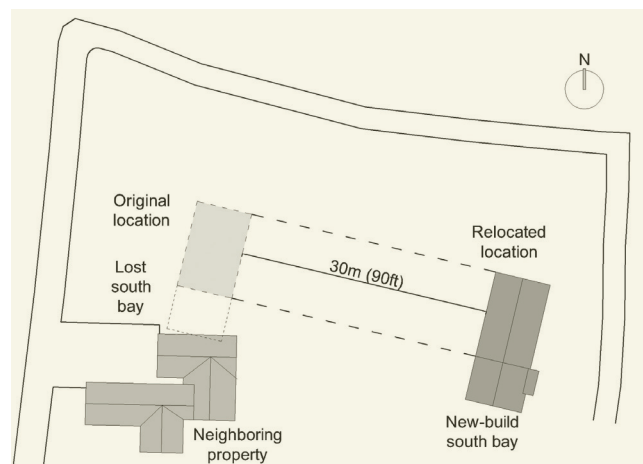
Hacton Cruck Hall, site plan showing original and relocated site, 2015.
